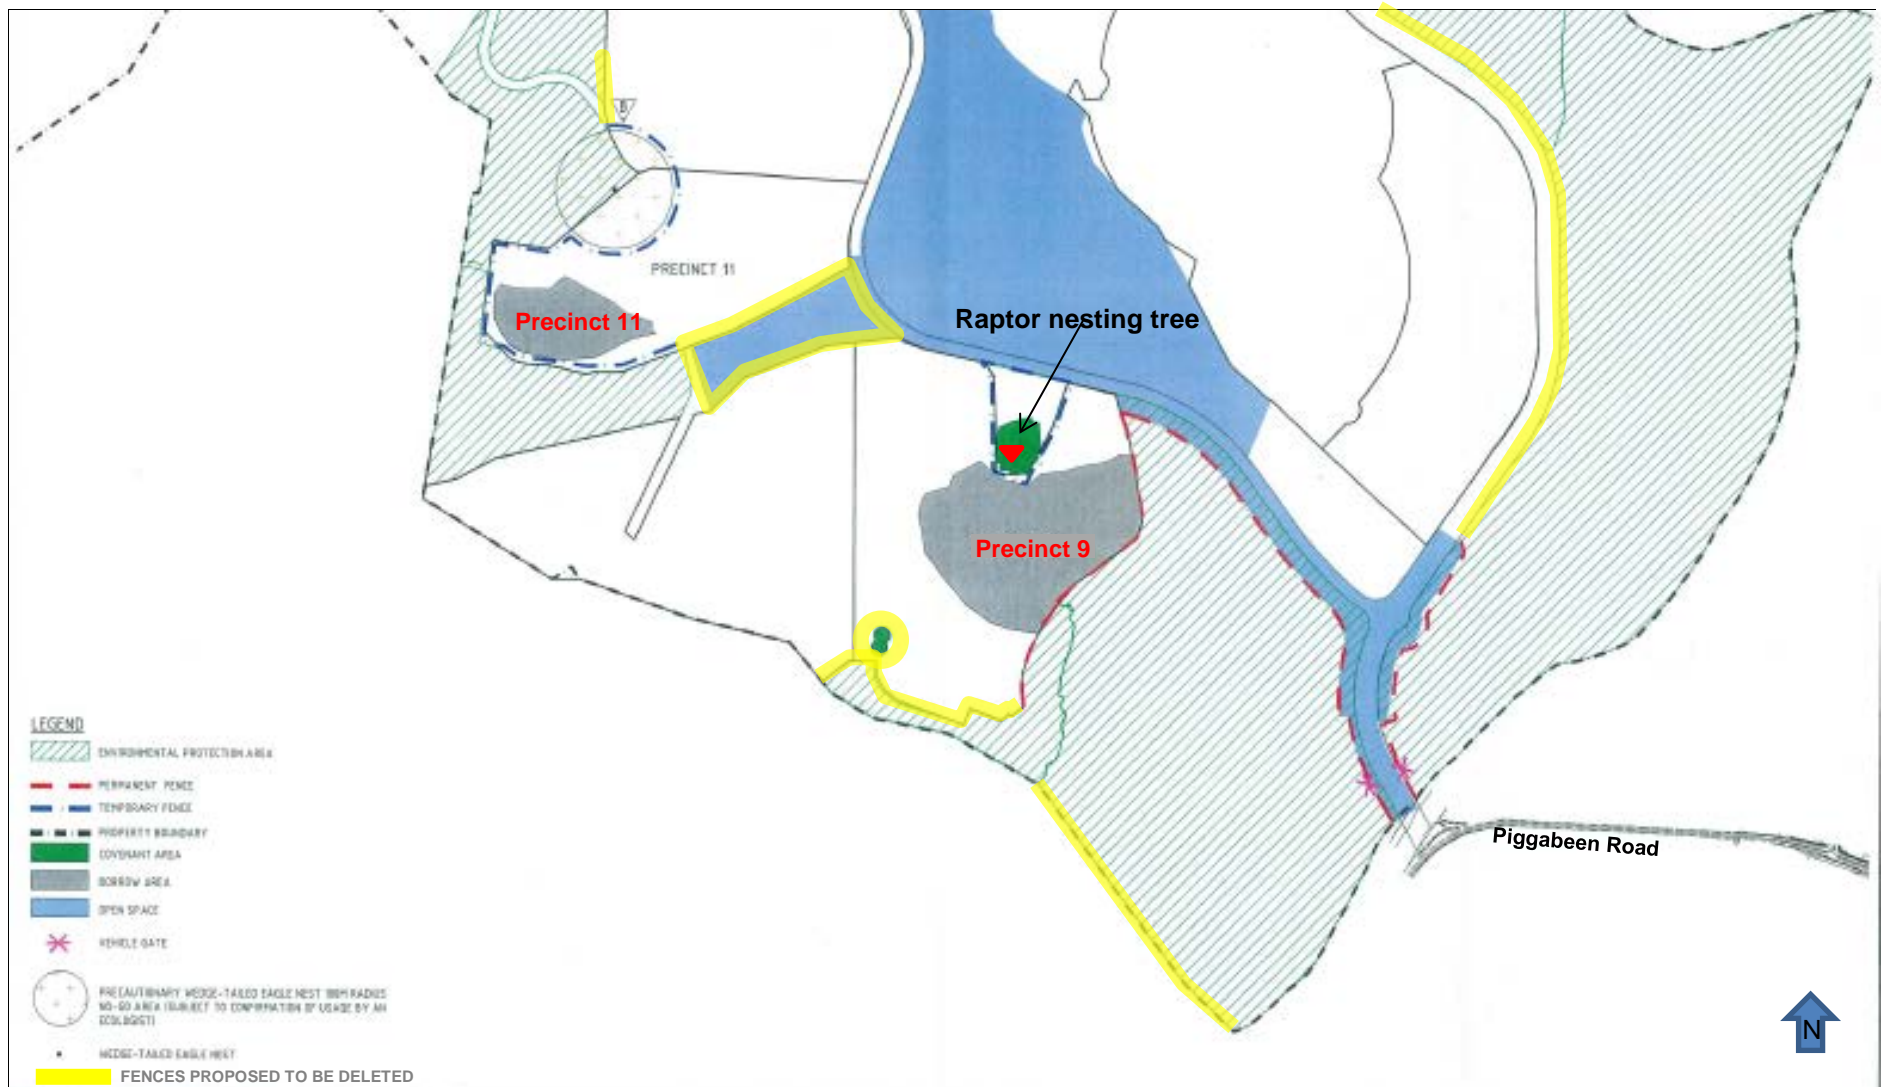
Proposed Amended Earthworks Fencing Plan (areas where fencing would be deleted from the plan shown in yellow)
